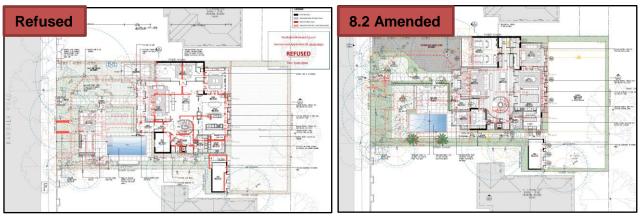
(left) & 4 (right). Refused and amended Ground Floor Plan. Source: Refused and Amended Architectural Plans
